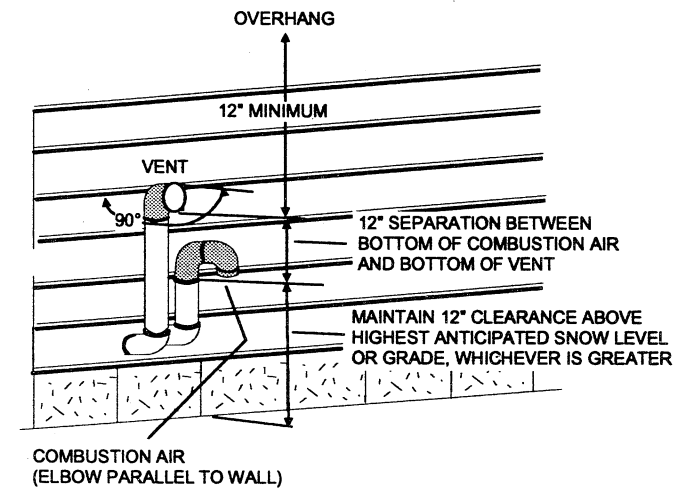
HORIZONTAL TERMINATION RAISED CONFIGURATION FOR ADDITIONAL CLEARANCE
